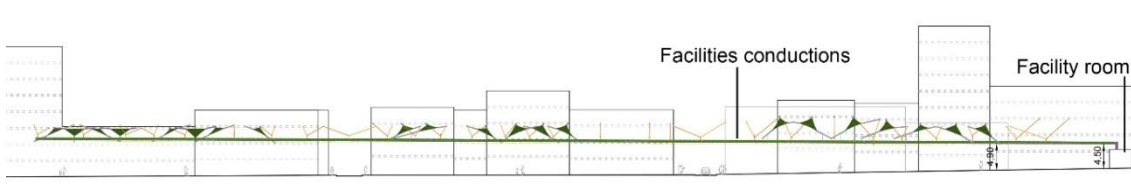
Santa María Street Elevation plan - Green Shady Structures (Source: SingularGreen).
